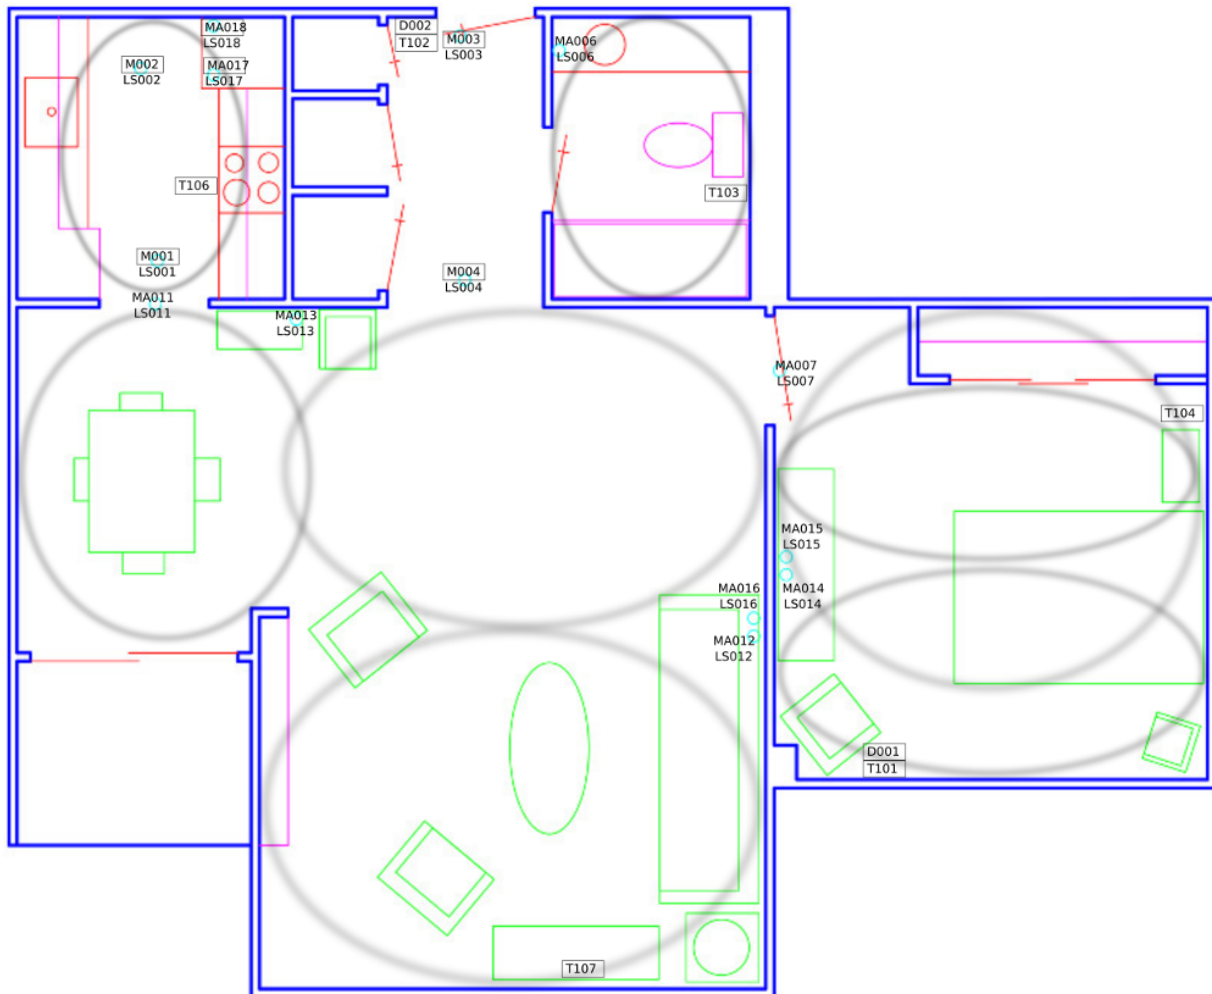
Floor plan and sensor placement for the testbed hh123.
